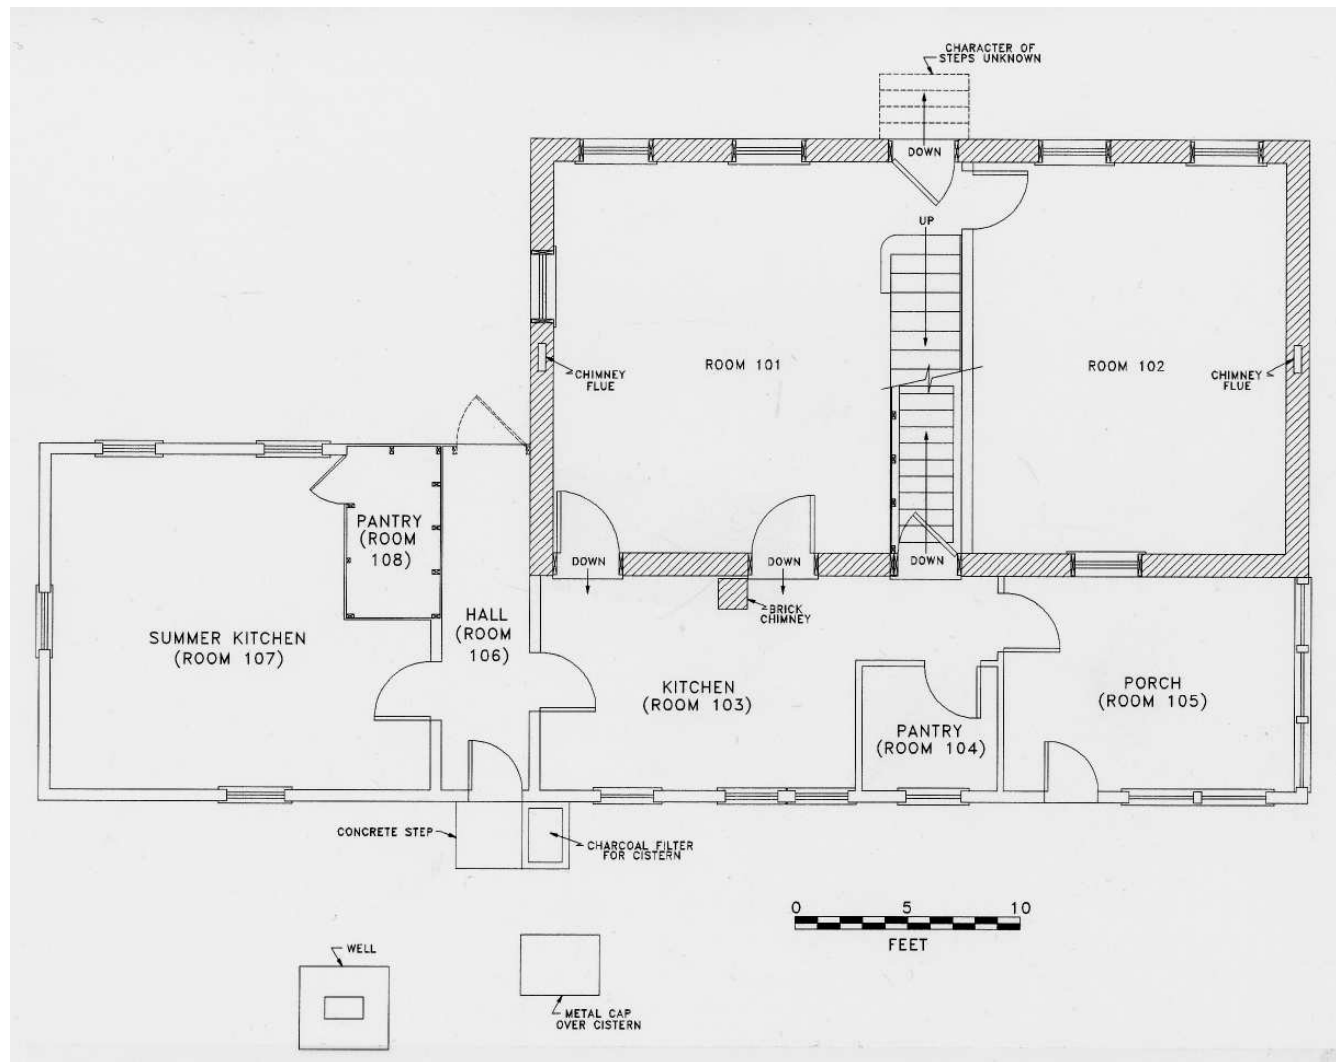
First floor plan of the Valentine House, showing early twentieth century additions (ca. 1925)
